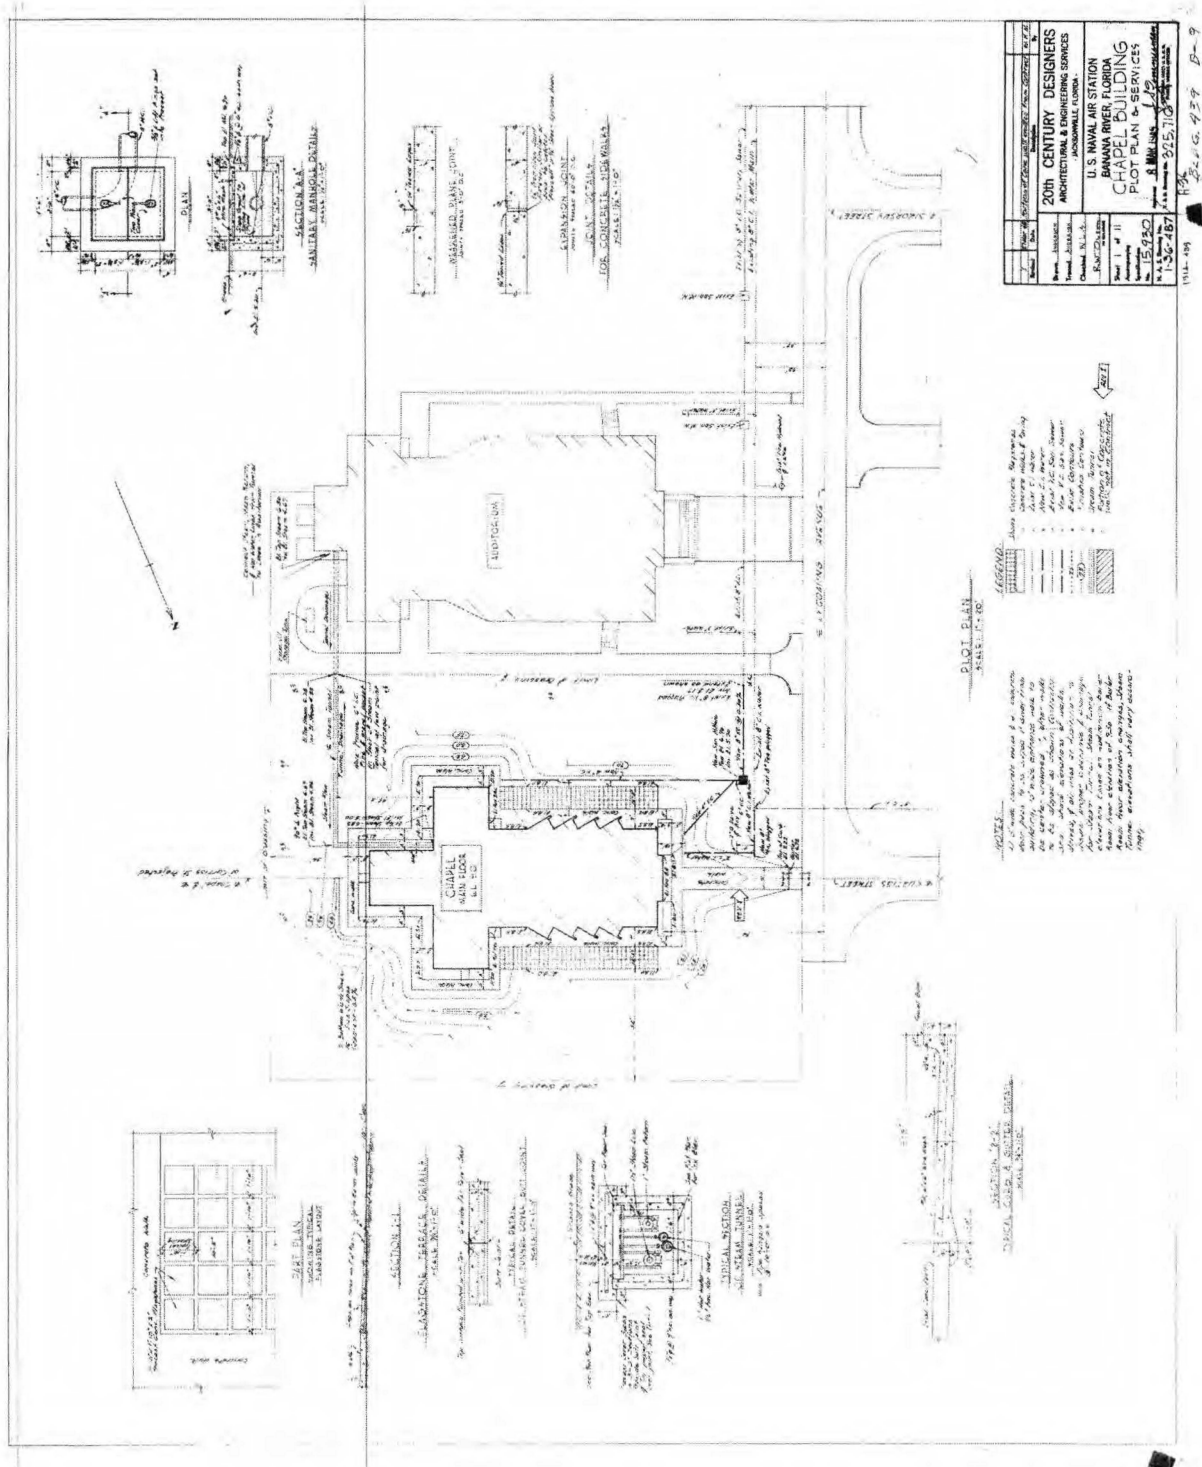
Plot Plan and Services, Chapel Building, U.S. Naval Air Station Banana River, Florida, 8 March 1945.
